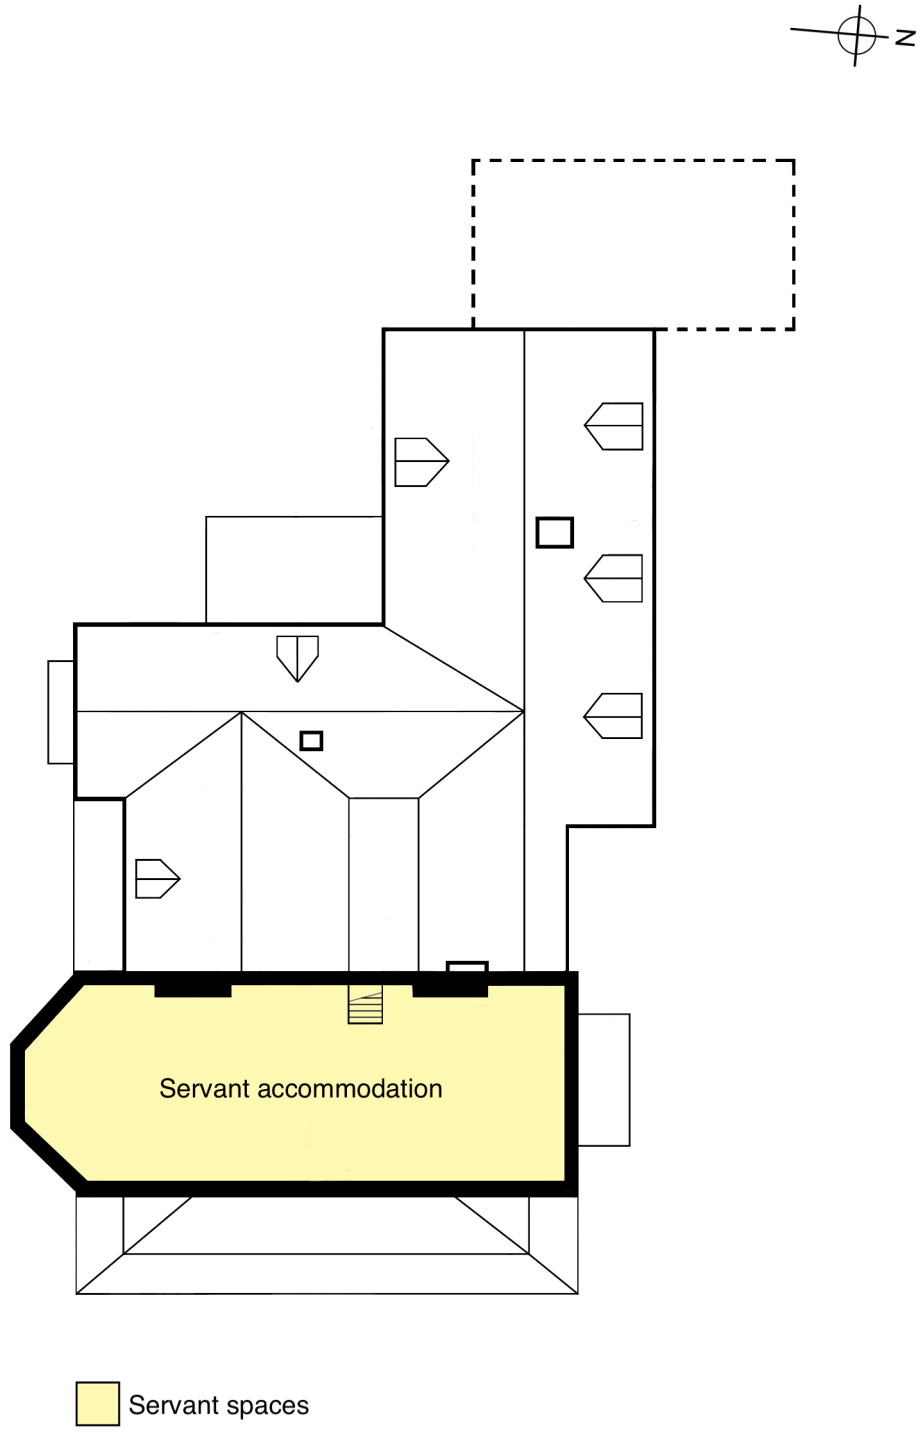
Kingscote c1859 Phase 1 second floor plan
